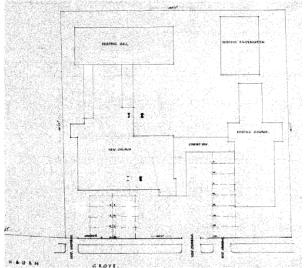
Site plan in 1961 showing the new church among the established buildings on the site. (Source: BP 28478)
